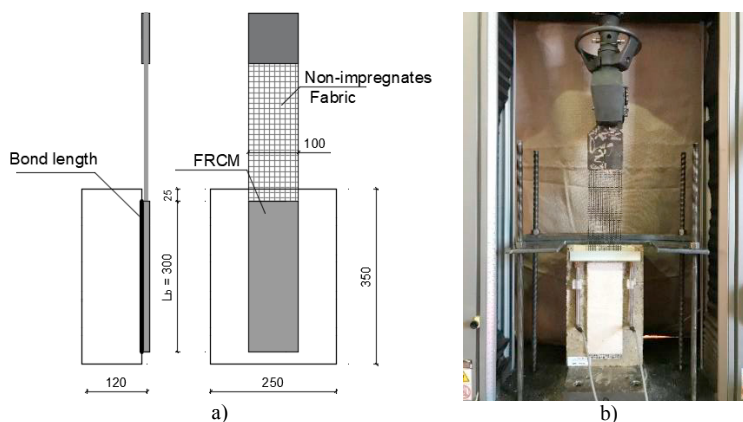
a) Geometric representation of specimen, b) Set-up testing machine
